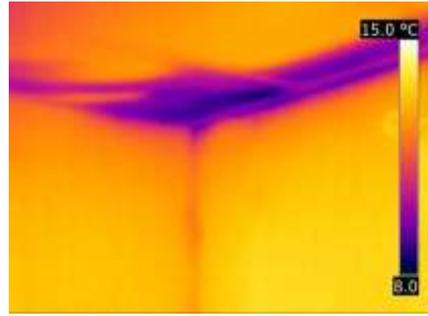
Internal IR image wall corner and ceiling junction plot 14
